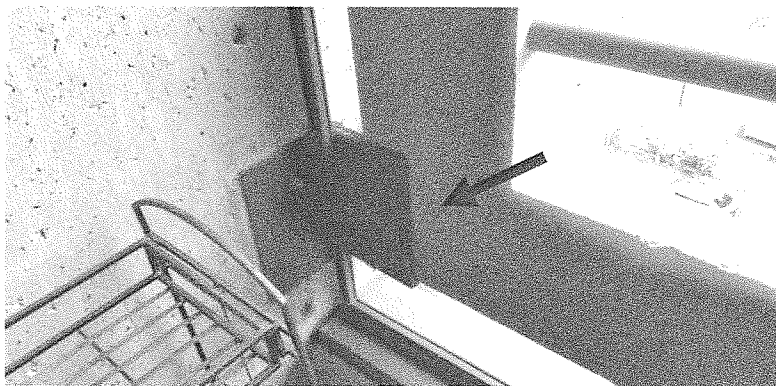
Concrete cracking next to anchor at balcony rail interior
